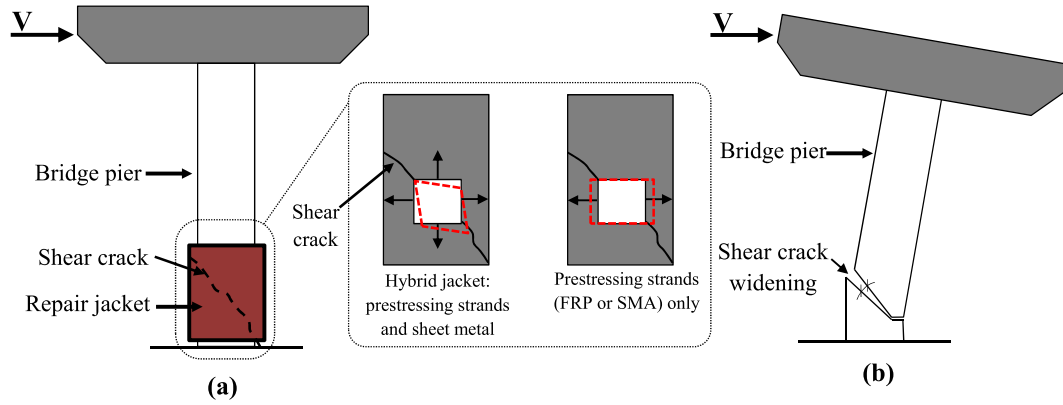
a stress state in the repair jacket along the shear crack for confining pressure from hybrid jacket and prestressing strands, b increase of shear deformations due to widening of shear cracks in an RC column with existing damage subjected to aftershock attacks.
